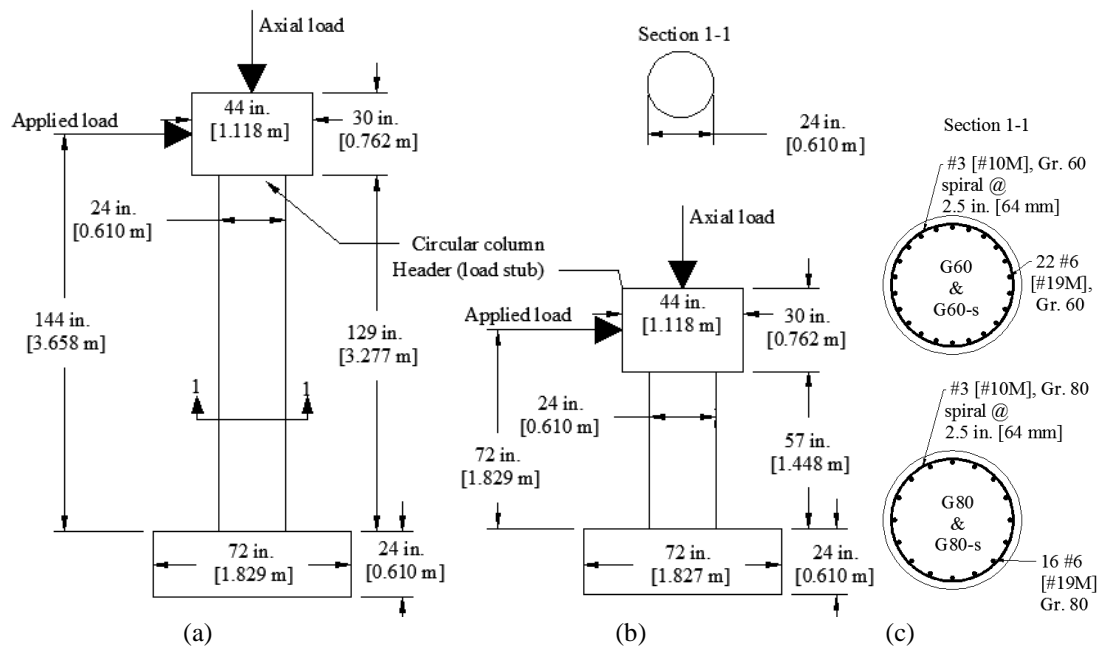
Specimen Geometry of: (a) Columns G60 & G80 and (b) Columns G60-s & G80-s; (c) Column Cross-Section Detailing.
